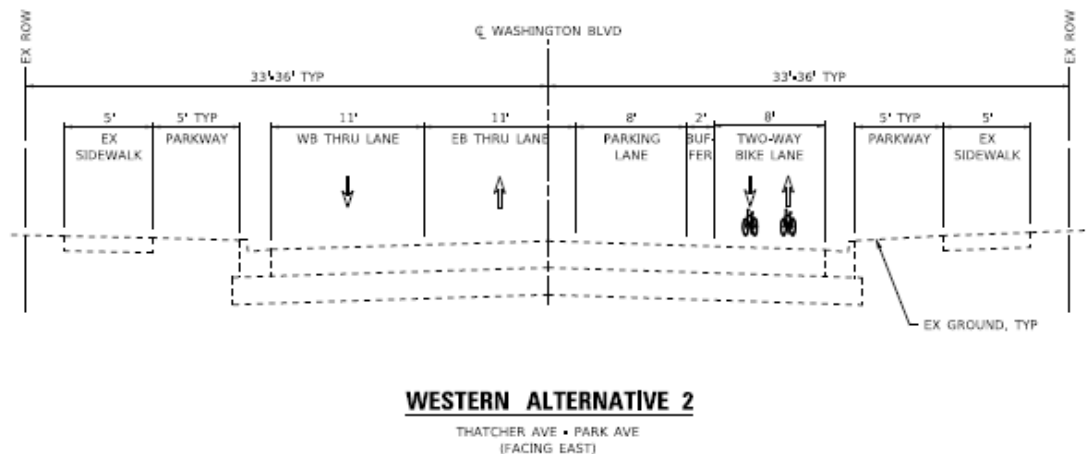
Western Typical Section Alternative 2 Washington Blvd.
